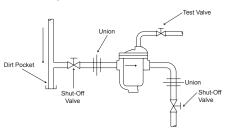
Standard hookup No. 800-816, 880-883 traps, with shutoff valves to isolate trap during testing, inspection or repair. Unions should be at right angles—not inline—to facilitate trap removal.
